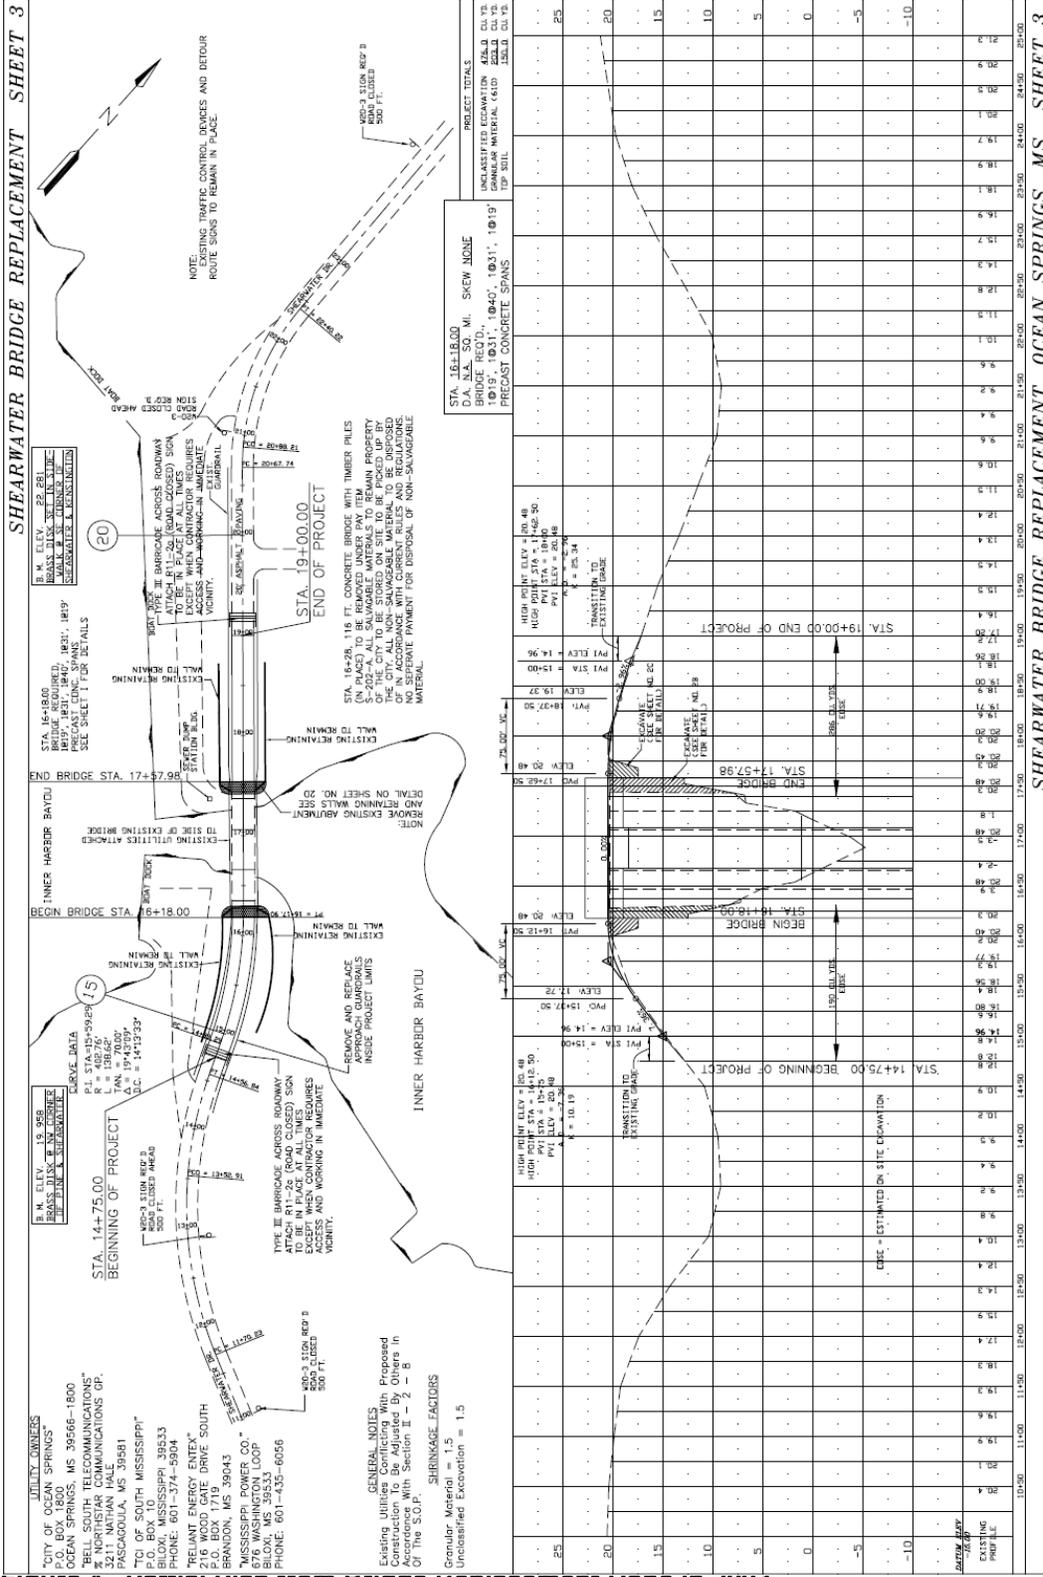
Partial Plan from Bridge Replacement Done in 2003
